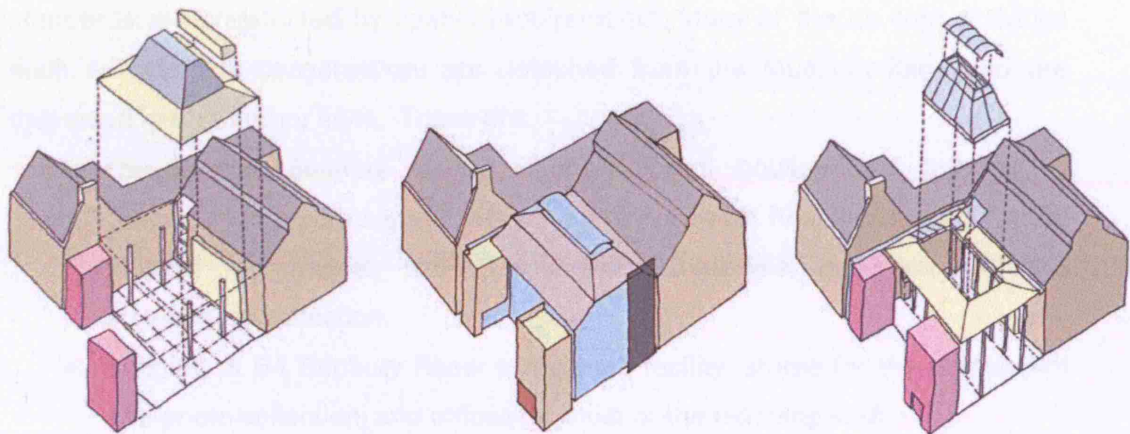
Architectural rendering of how floor levels will work with existing PRM (left) and roof volume and illumination scheme (middle, right)
